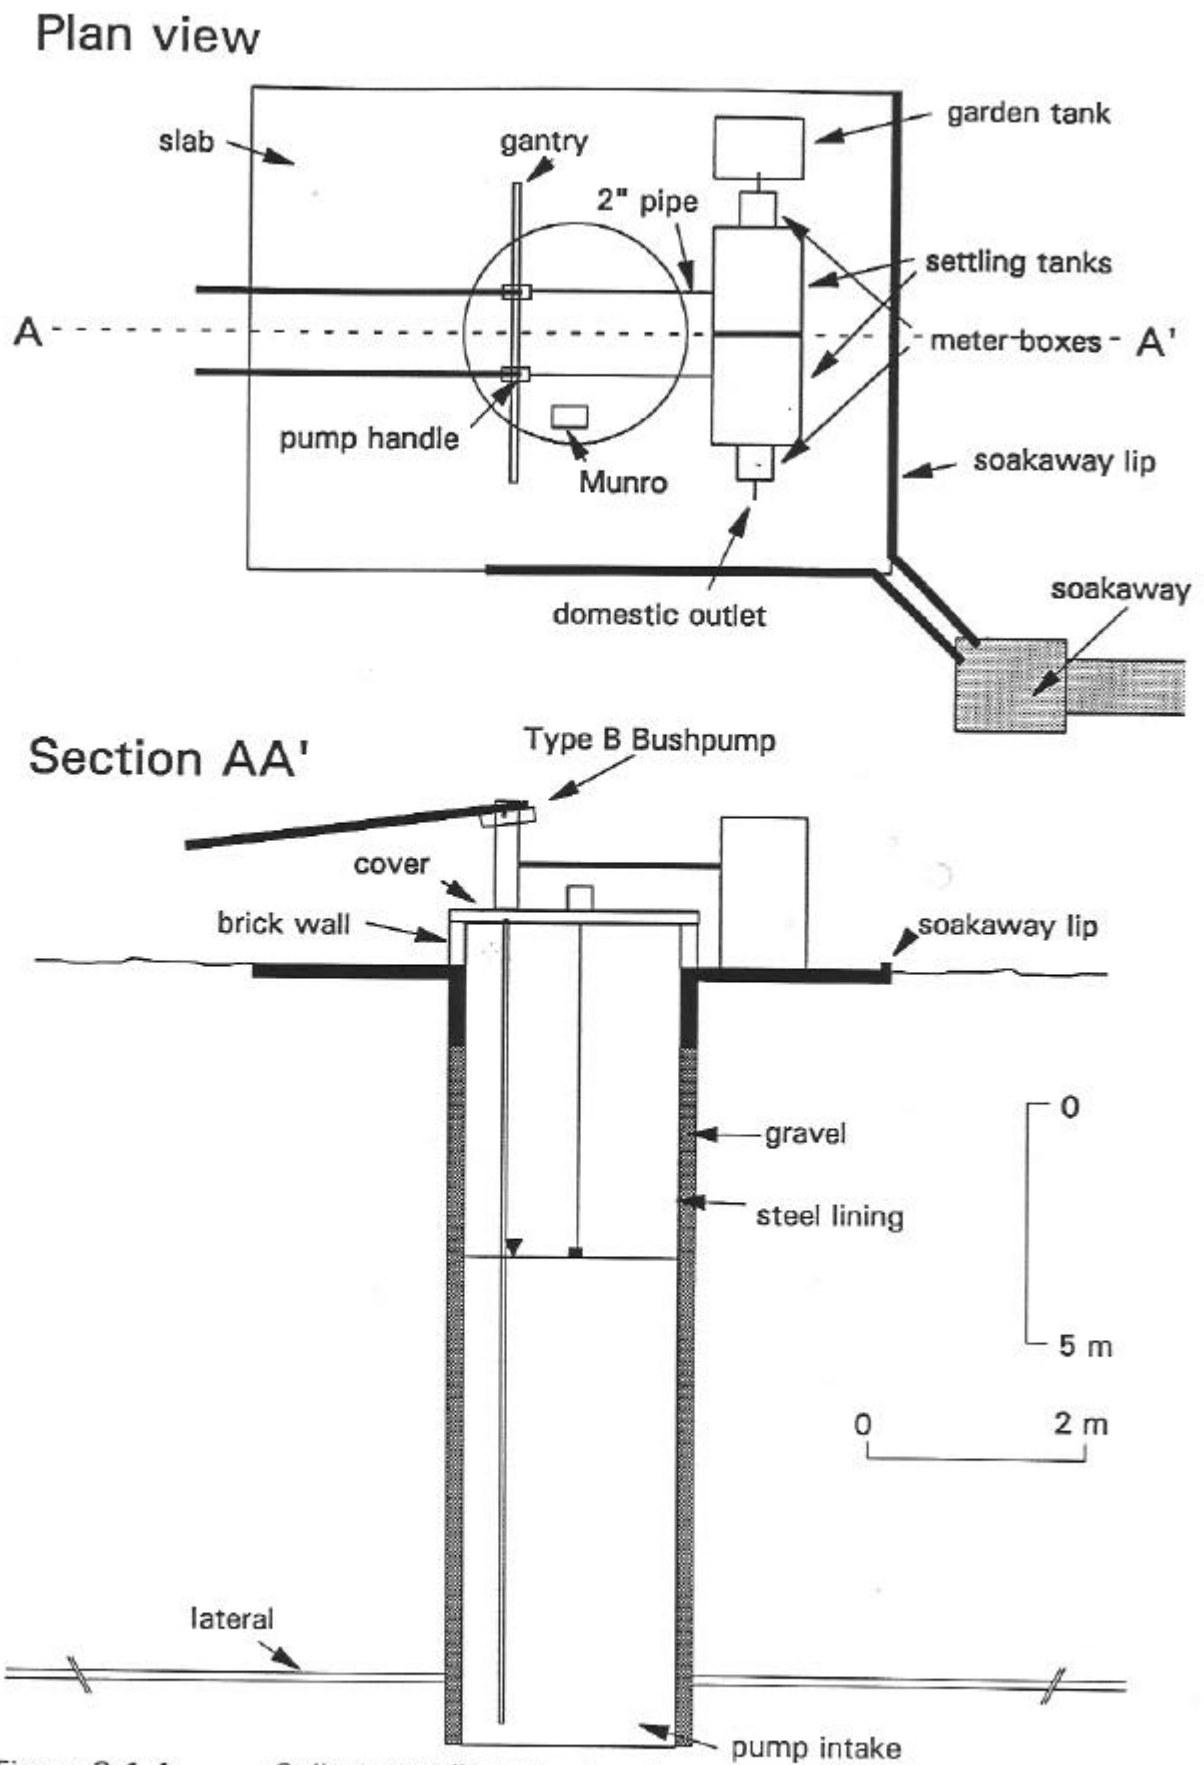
Collector well and headworks construction, site 1, Muzondidya
